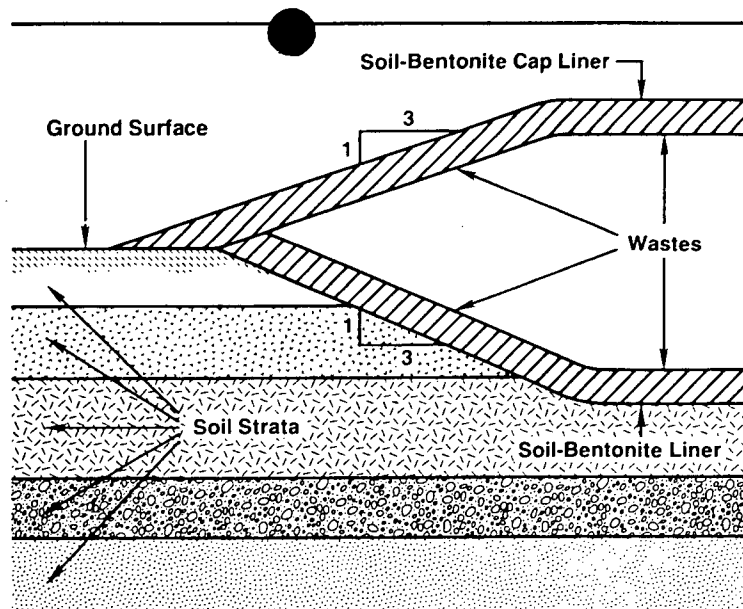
CROSS SECTION OF TYPICAL SOIL-BENTONITE LINER AND CAP
